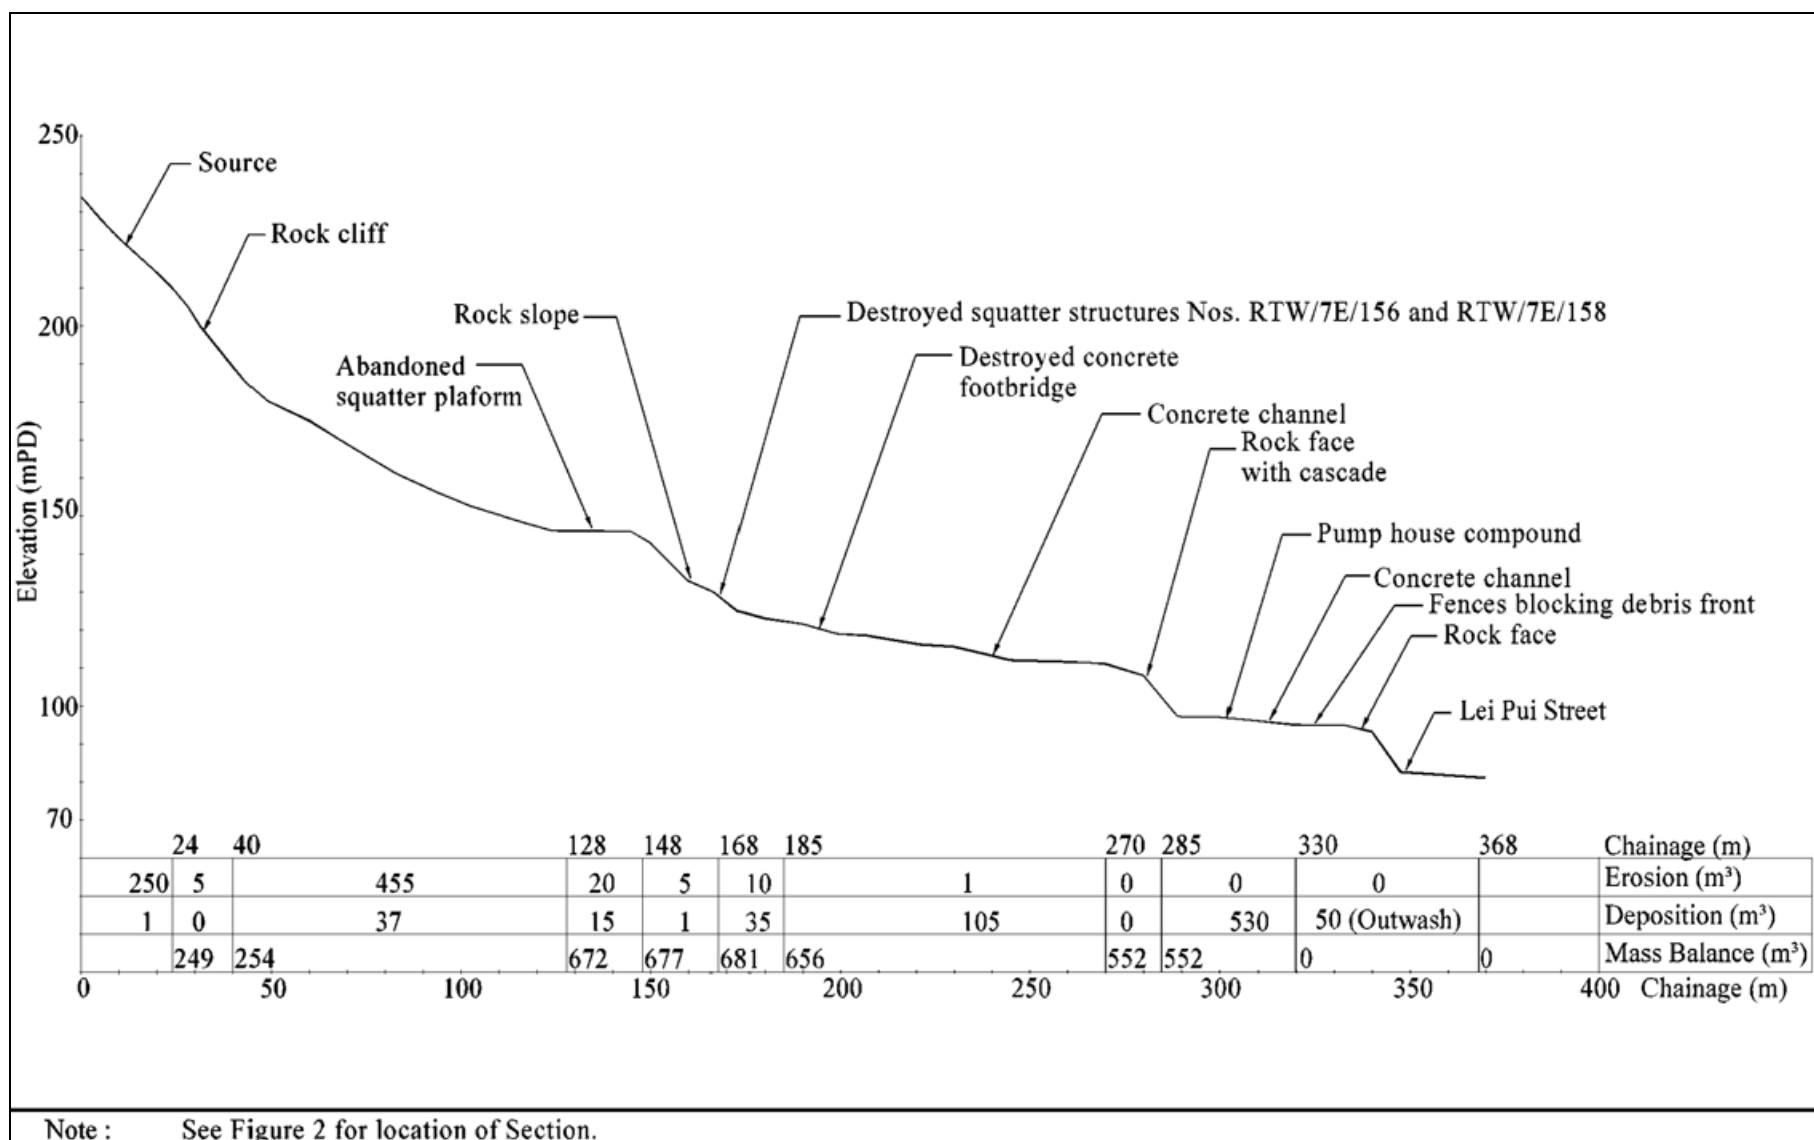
Longitudinal Section (A - A) of the Source and Debris Trail
